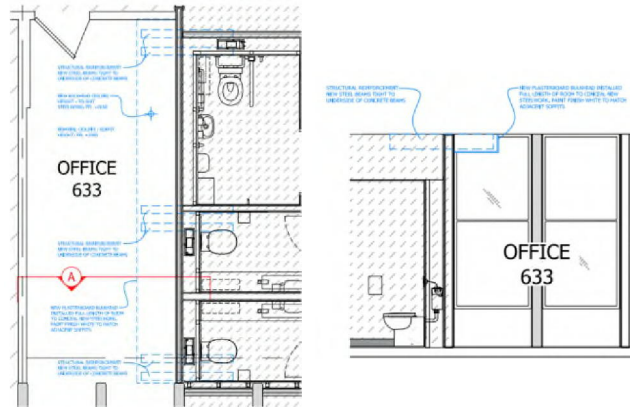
and 6b – Additional steel reinforcement (repeated at Levels 5, 6 and 7) (Extracts from drawing ref. 3147-P7-2605)
